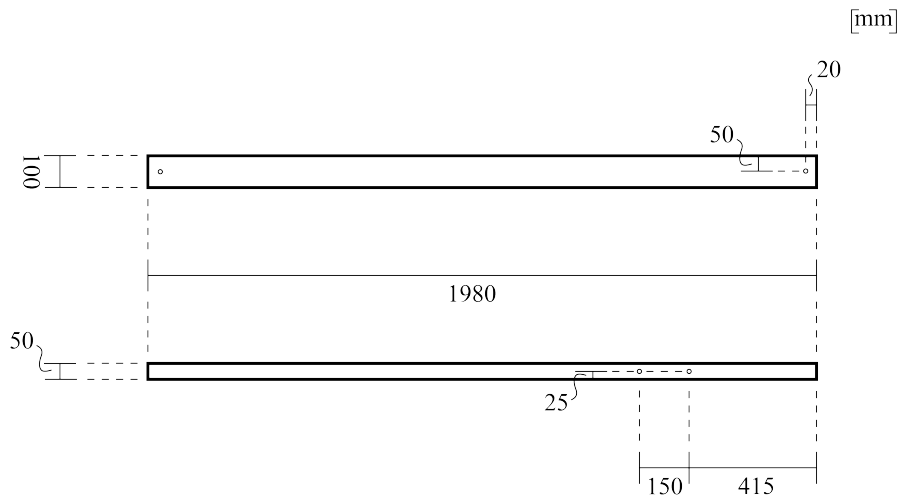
Drawing of a horizontal element in the middle of a module supporting the cross beams with measurements.
